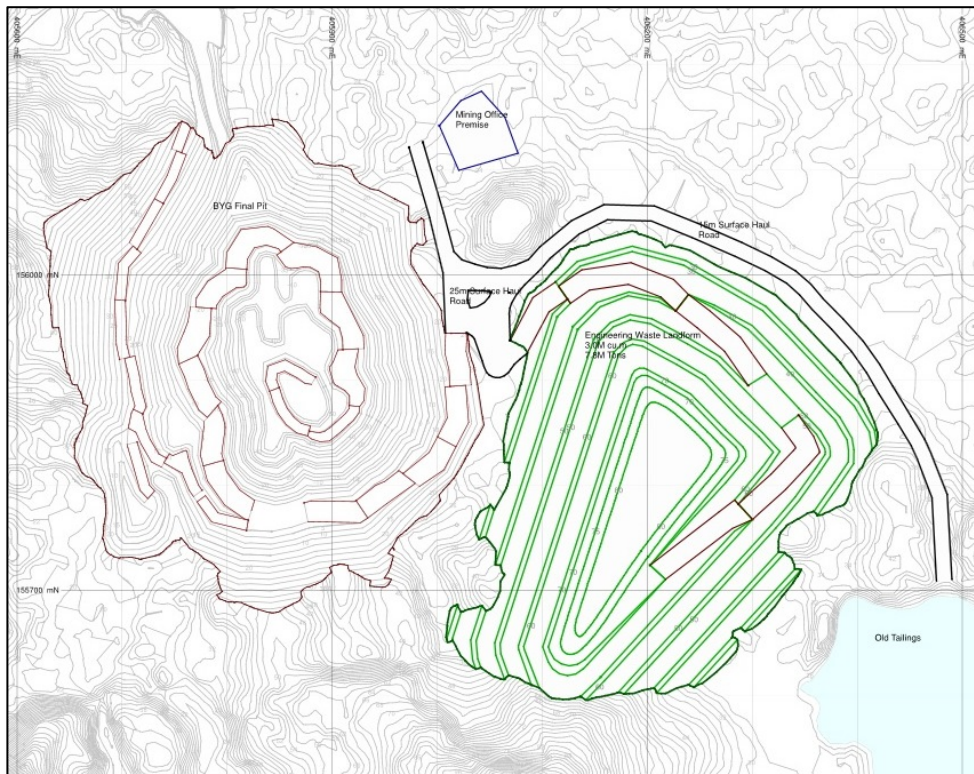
BYG-Krian: Road and Ramp Configuration Option
